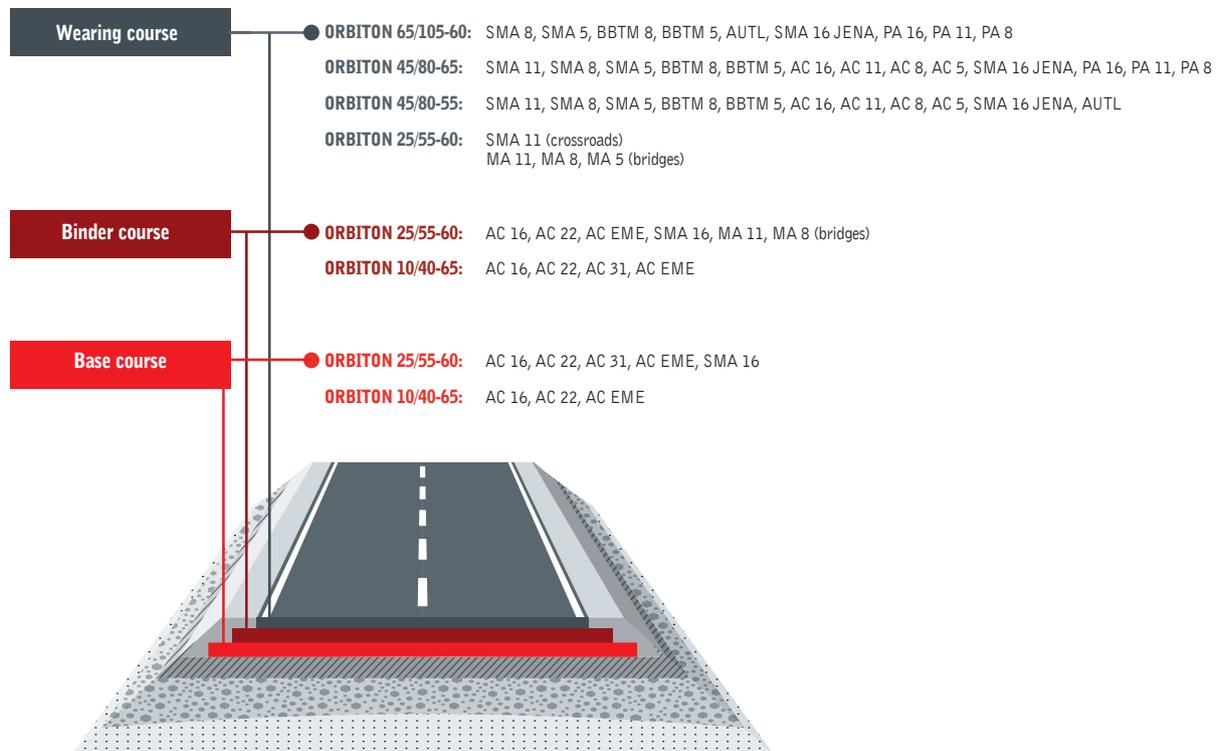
Proposed use of ORBITON modified bitumen for conventional flexible pavement construction [own elaboration]
